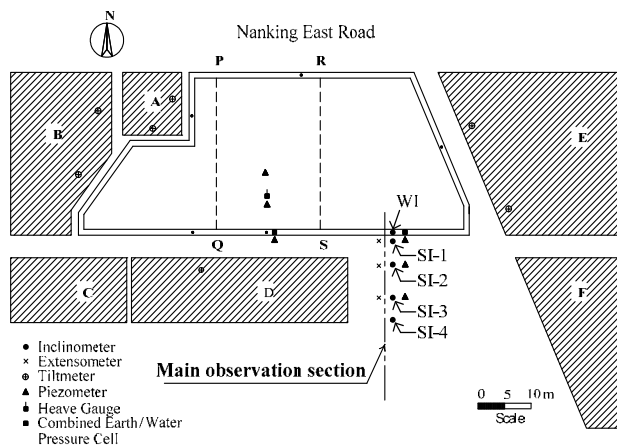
Plan view of the TNEC case and the instrumentation plan
